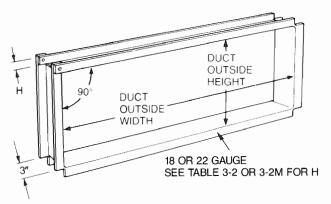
CHANNEL REINFORCEMENT, AT JOINTS ON DUCTS WITH WIDTH LESS THAN 48"
